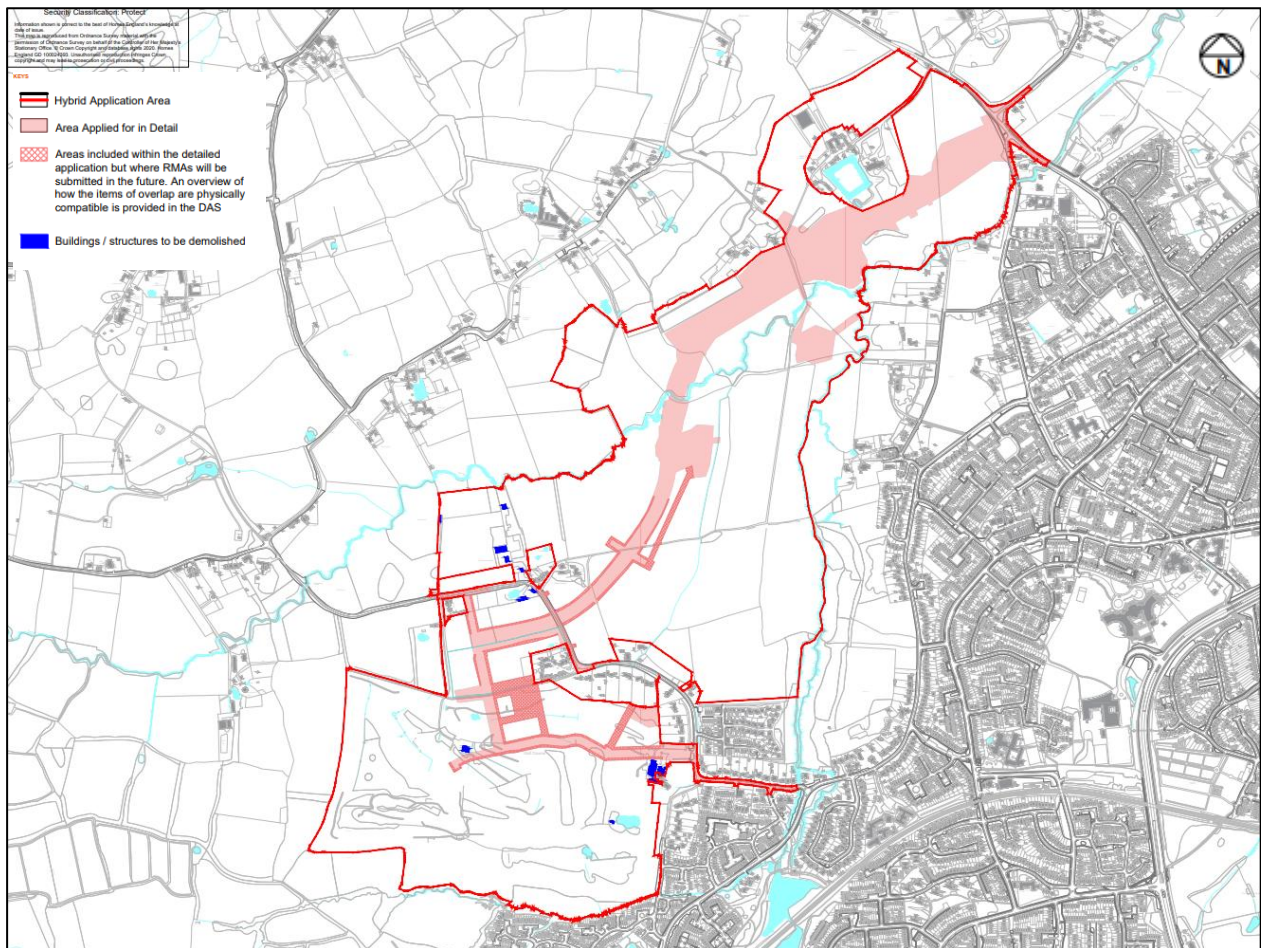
Demolition Plan for the Proposed Development. (WOI-HPA-PLAN-DEM-01)
